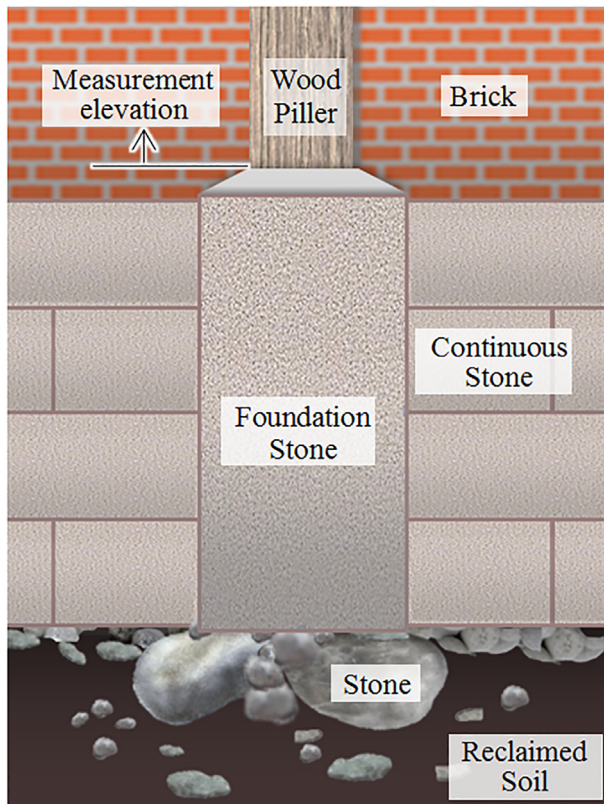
Schematic diagram of the foundation based on Photograph 3.
